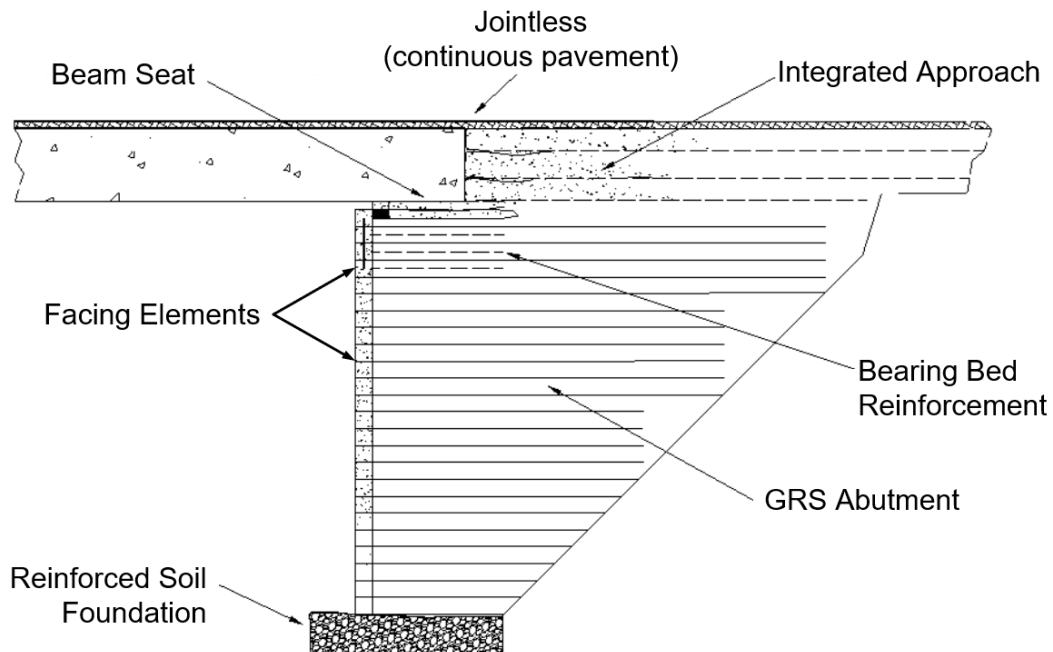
Cross Section - Geosynthetic Reinforced Soil Abutment
